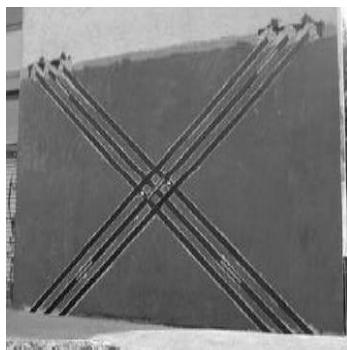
Seismic retrofitting of masonry shear wall with GFRP sheets
